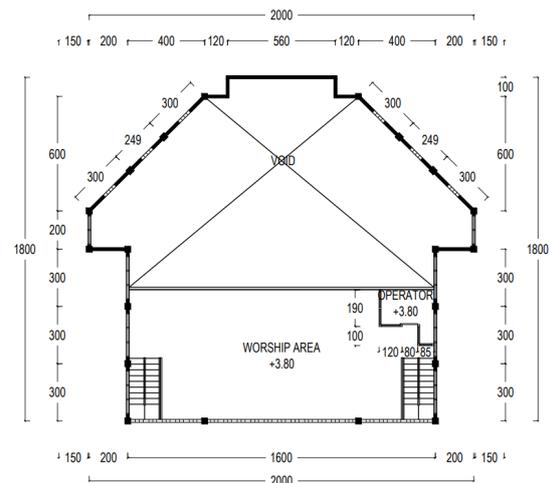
Floor plan of the mezzanine floor of the worship room of the Palihan Javanese Christian Church
